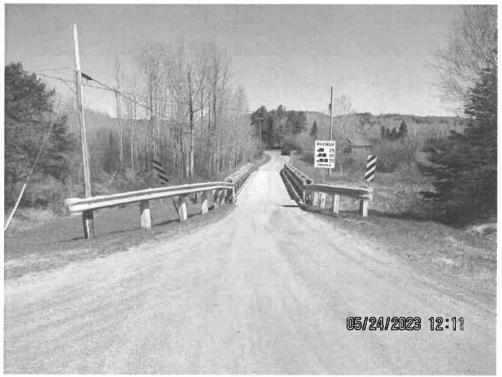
Guide rail mounted at improper height at southwest corner. Southwest Hazard Marker sign is leaning.
